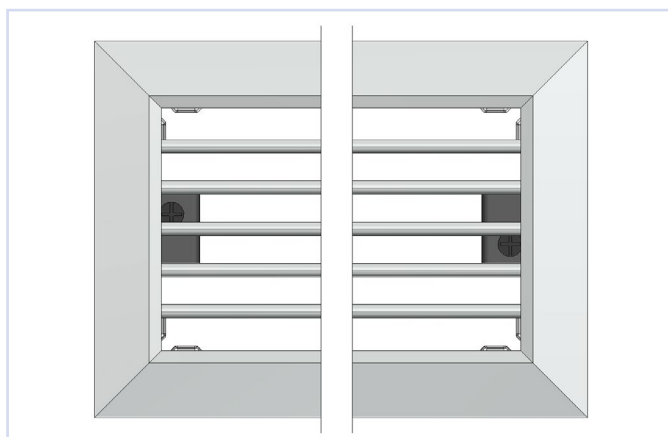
, Mounting, front grille. The front grille is easily mounted in the telescopic frame. Screws in each short side of the front grille lock against slot grooves in the telescopic frame.
